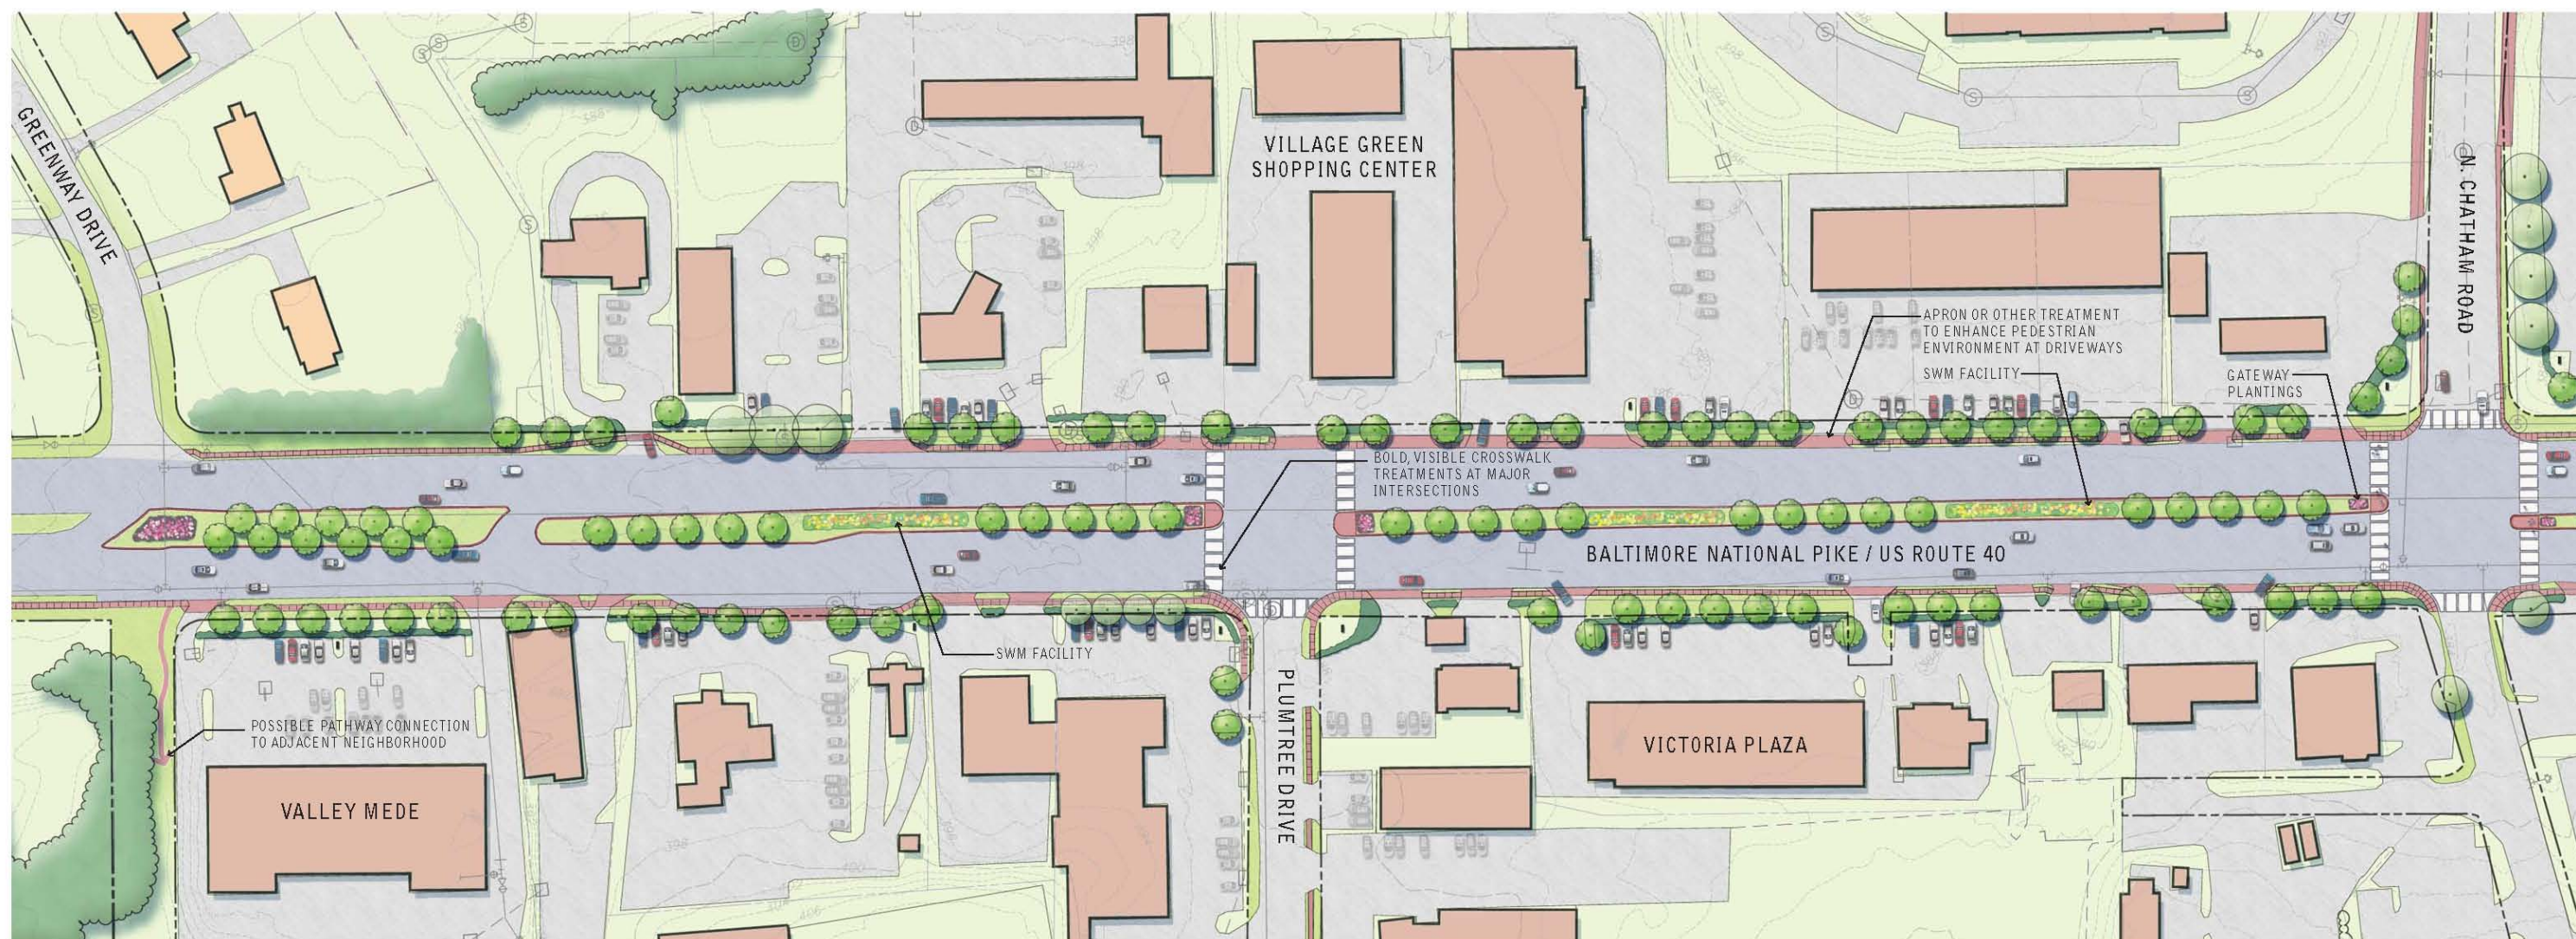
Illustrative Master Plan – Suburban Boulevard Section
